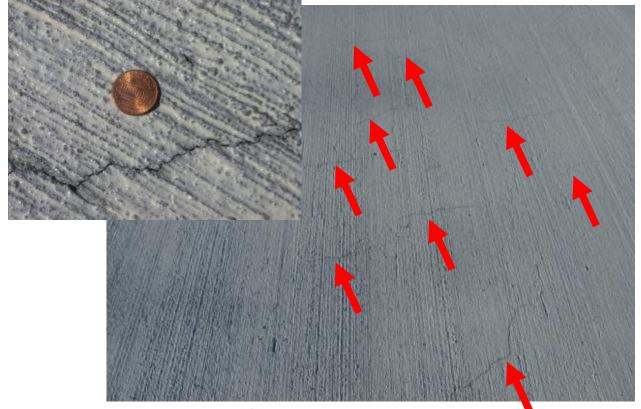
Plastic cracking observed 6 hours after concrete placing, Olive Lane Bridge.
